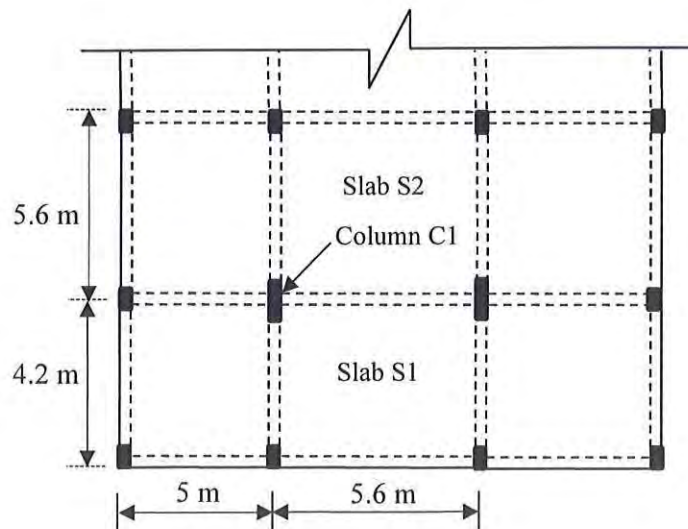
Floor Layout Plan of 10-Storeyed Residential Building
